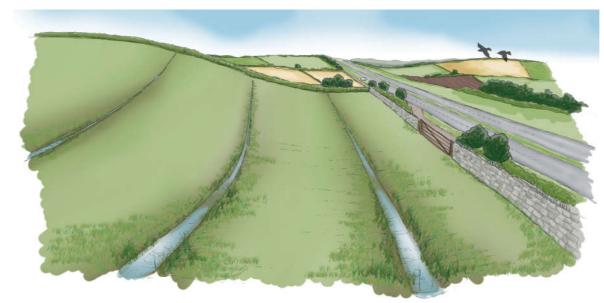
Cross-slope swales constructed along land contours to reduce overland flow to the road network (@ Atkins
